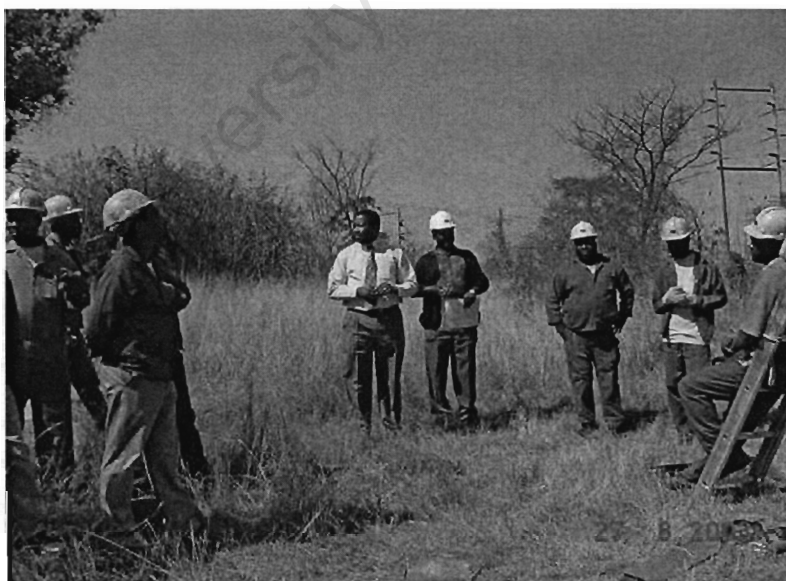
Site briefing of linesman at the start of TLA installation on structure no. 4.
